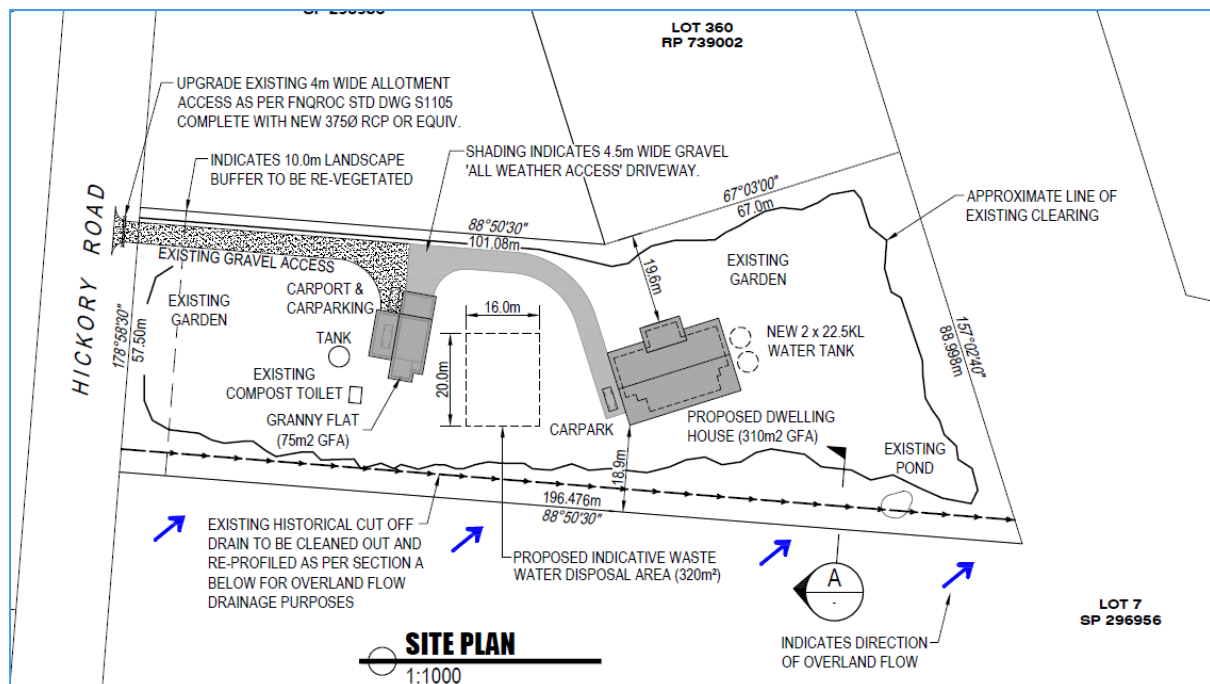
DEVELOPMENT CONCEPT – SITE PLAN
